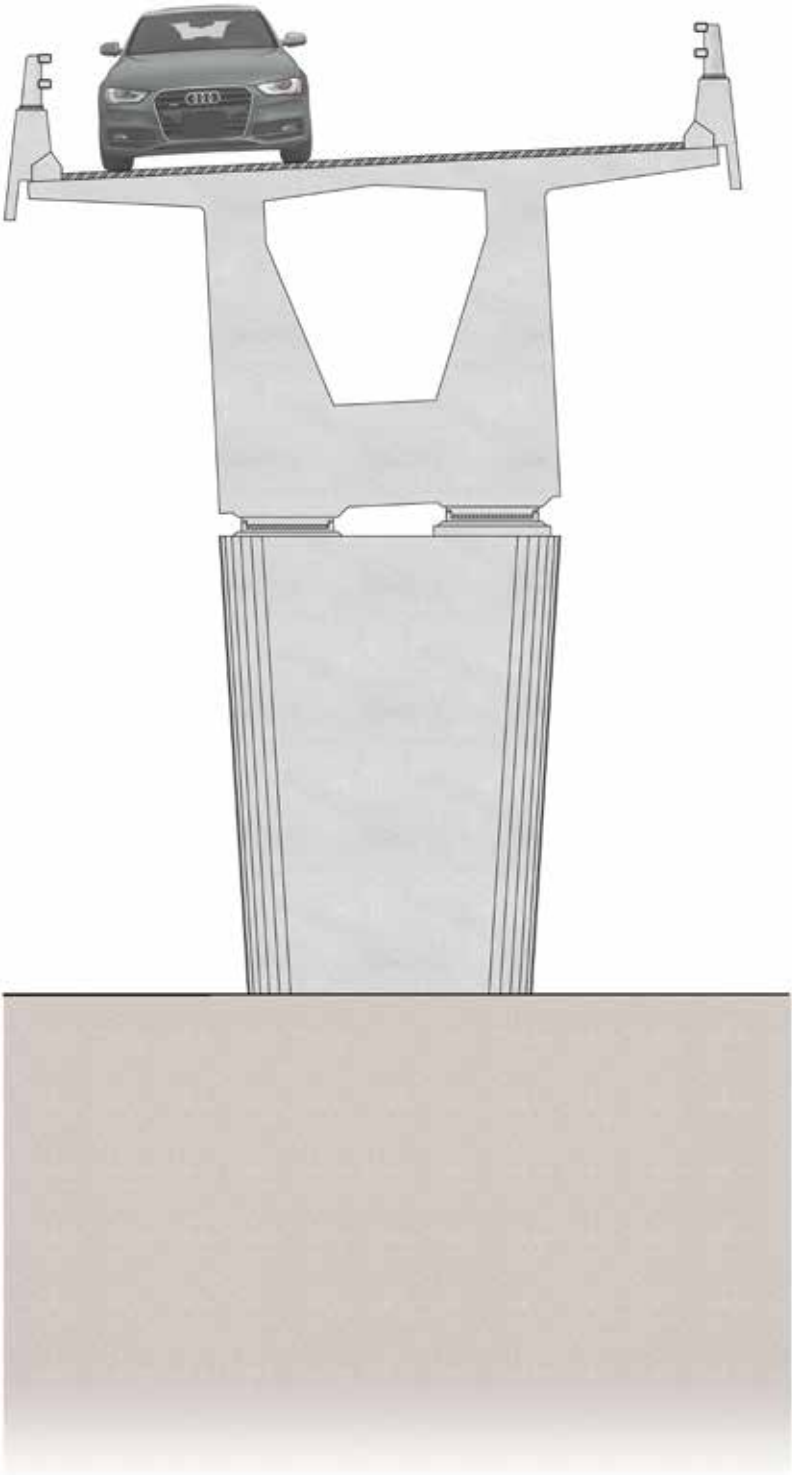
Bridge 1 cross-section, scale 1:100 showing tapered, curved pier shape
